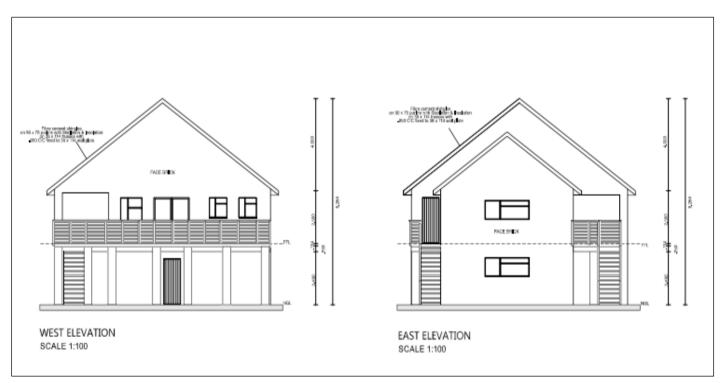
West and East Elevation of Proposed Managers Cottages (Louw Designs, 2023)
